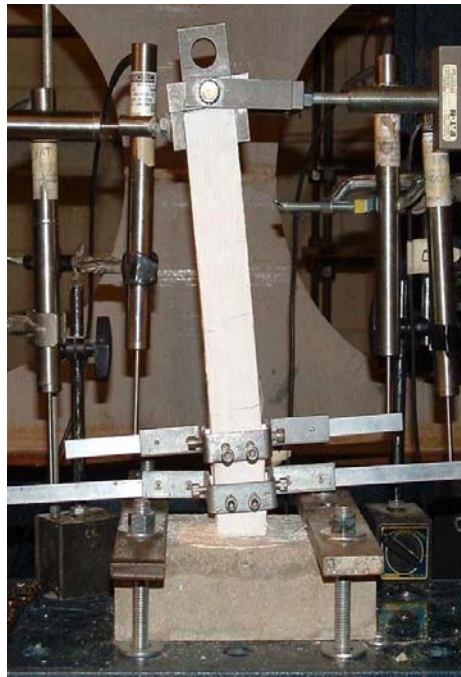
Column Cracking Pattern at Displacement Level 4 for Model Column Test M-2, 5-mm DHFRP Reinforced R/C Column.
